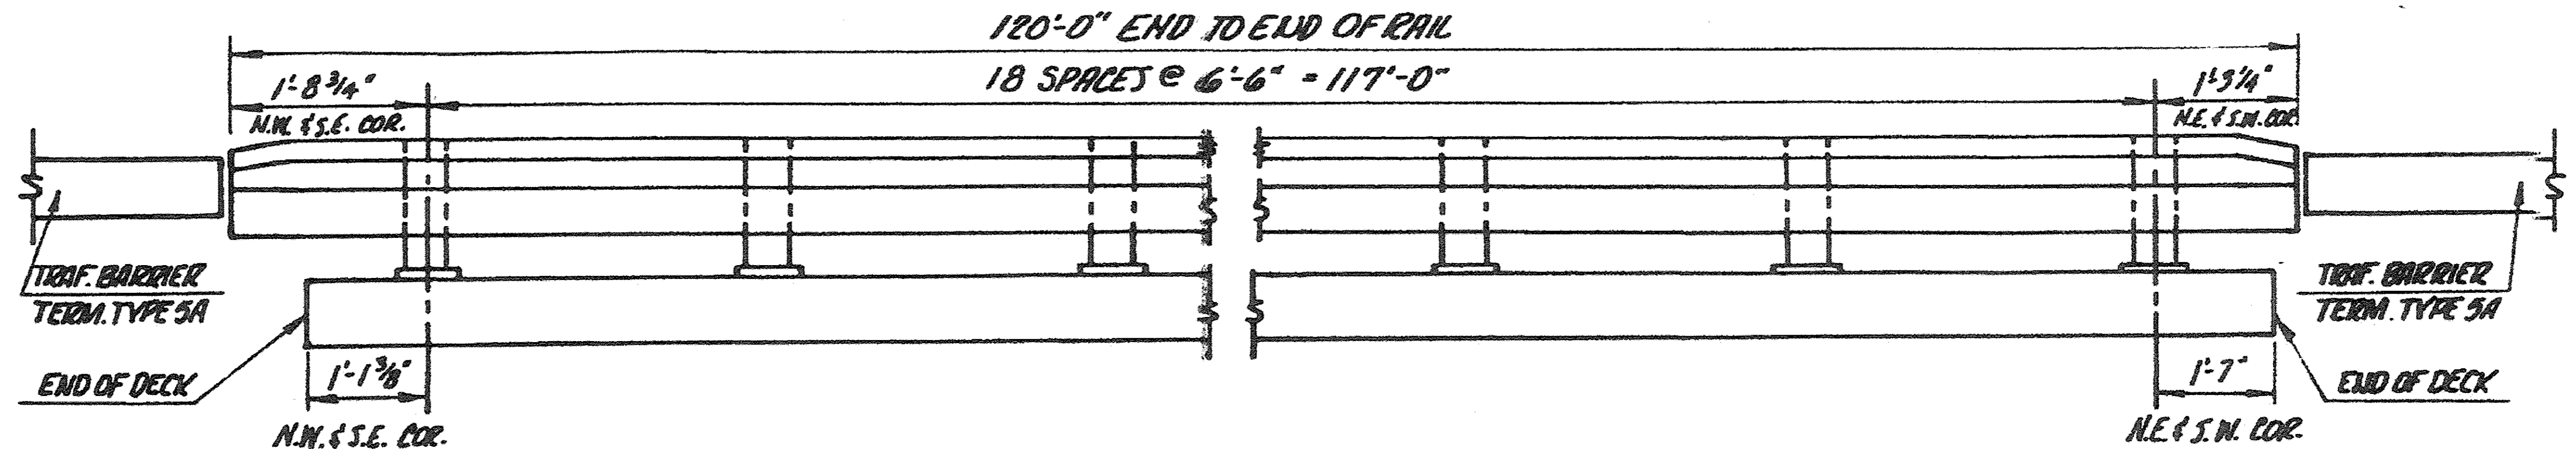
DETAIL OF POST SPACING FOR STEEL RAIL RETROFIT
